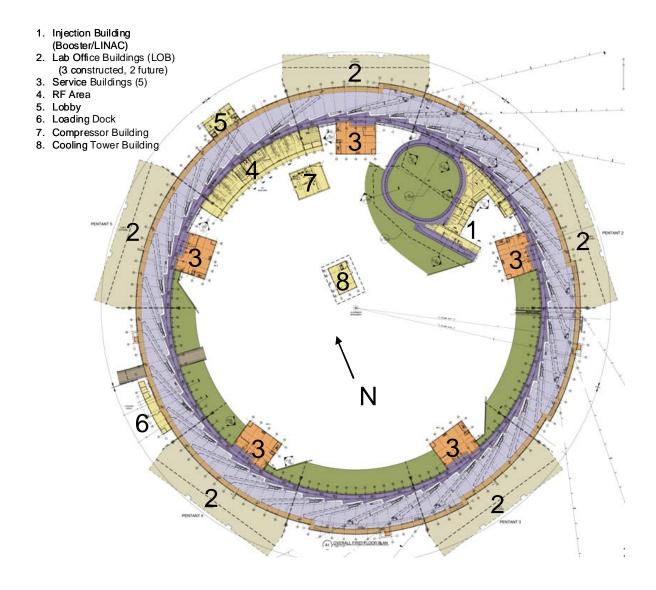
Site plan of NSLS-II building with projected locations for long beamlines. 1) Injection Building (Linac/Booster), 2) Lab Office Buildings, 3) Service Buildings (5), 4) RF Area, 5) Lobby, 6) Loading Dock, 7) Compressor Building, 8) Cooling Tower Building.
